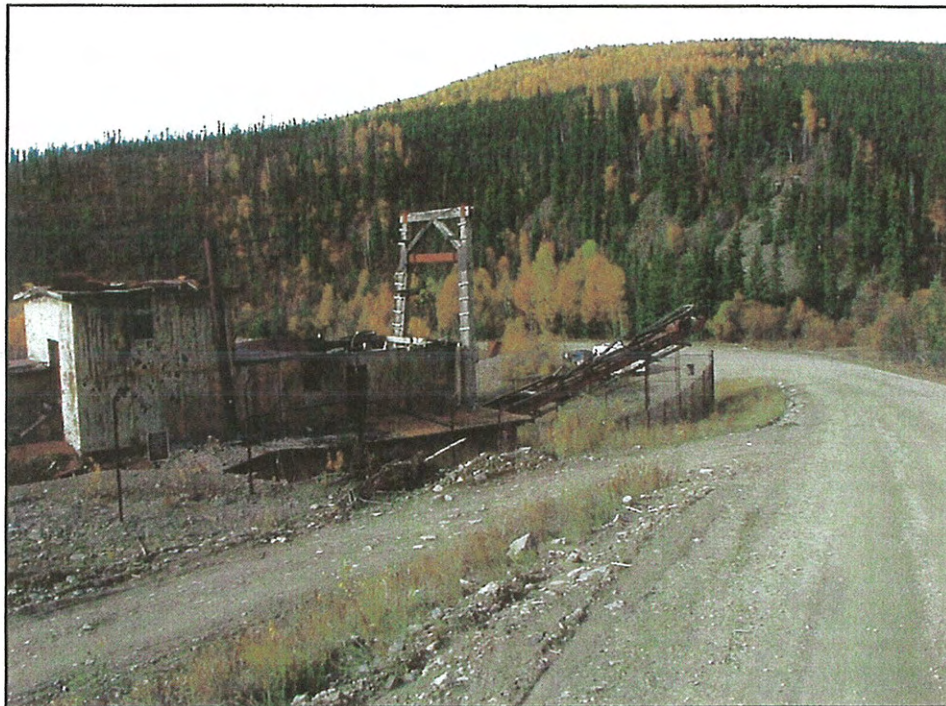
Jack Wade Dredge, MP 86 Taylor Highway. Dredge is proposed to be dismantled by BLM, date for dismantlement has not been set. Road will be widened away from dredge. (9/12/02).
